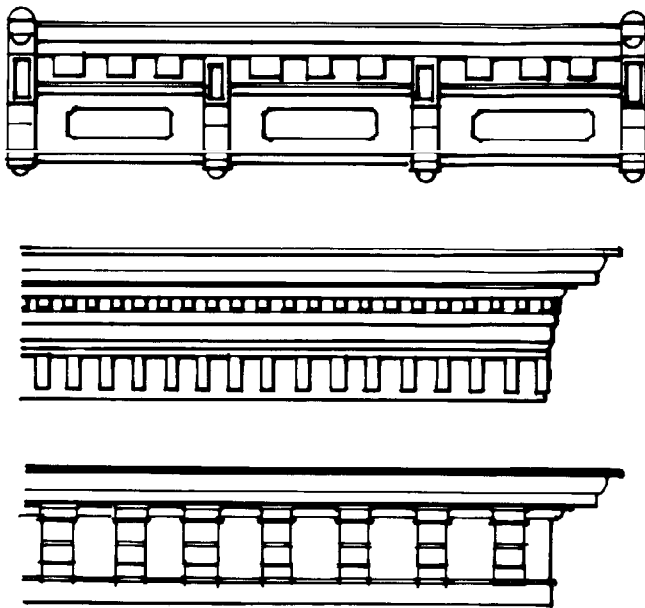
Details of Annapolis cornices. In new buildings and additions, the facade should be capped by a cornice relating to the scale of the proposed facade.
